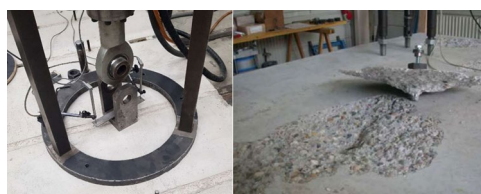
(left) Experimental rig for anchor testing in concrete and (right) after pulling out with the whole concrete block as waste.
